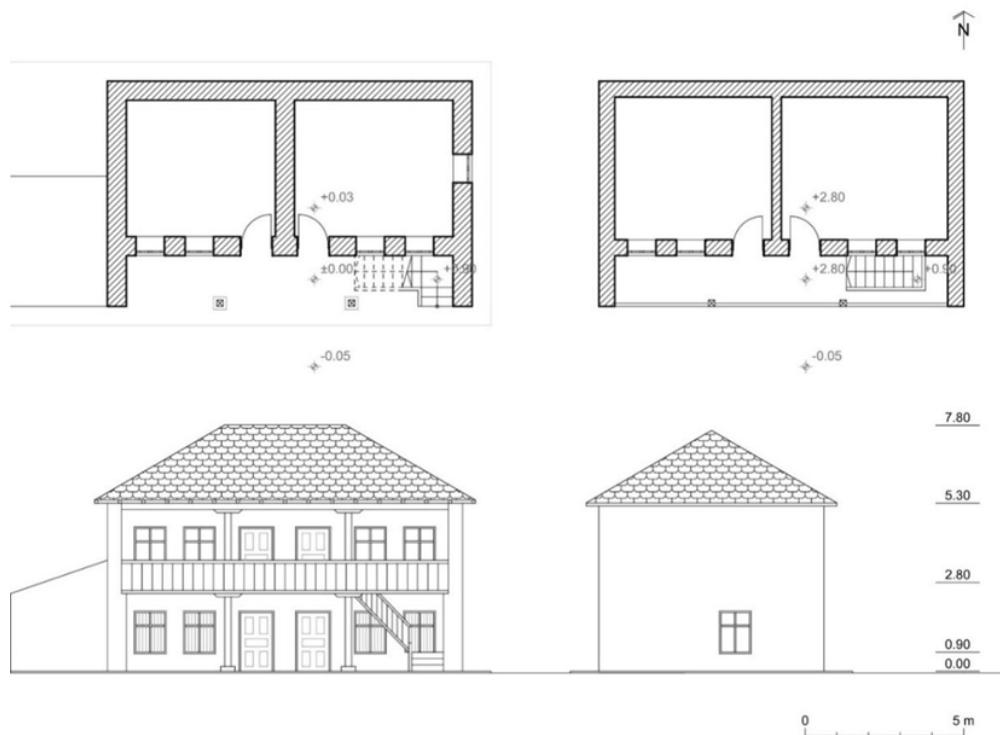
Floor plan and elevations of Petković family house in Laplje Selo
